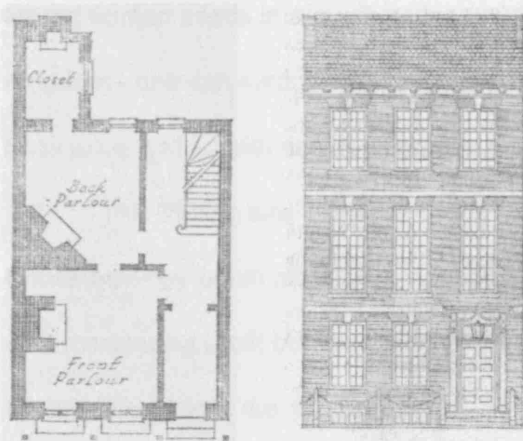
Plan and front elevation of a typical Terraced House (late 17<sup>th</sup> century) (Summerson 1945, p. 31,34)
